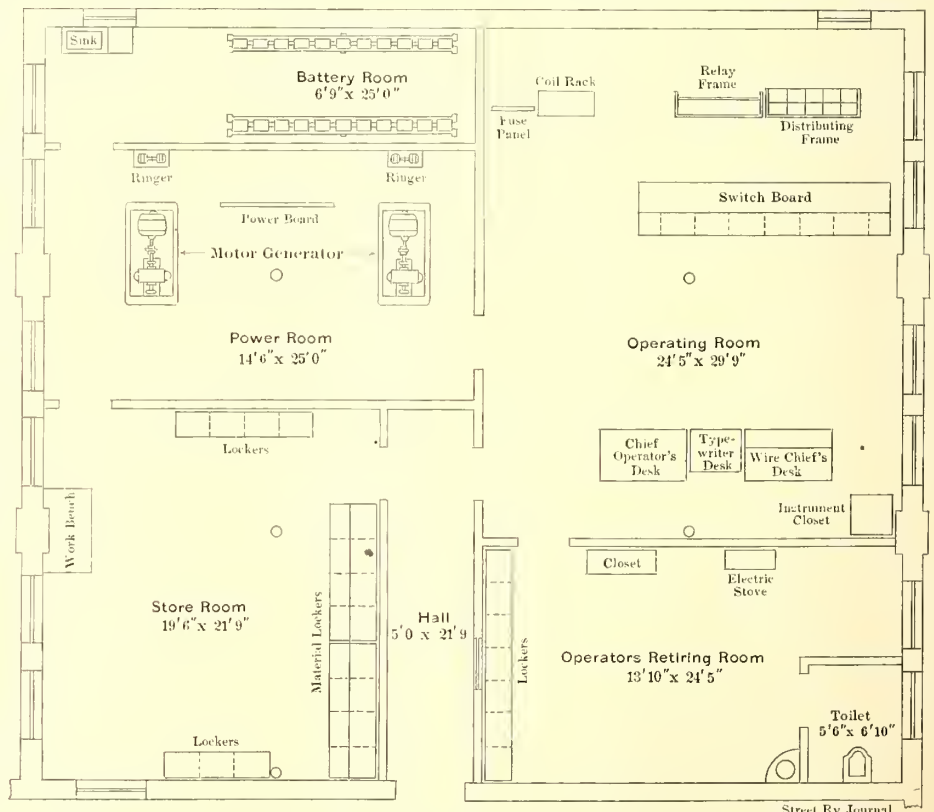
PLAN OF TELEPHONE STATION, MANHATTAN ELEVATED RAILWAY
